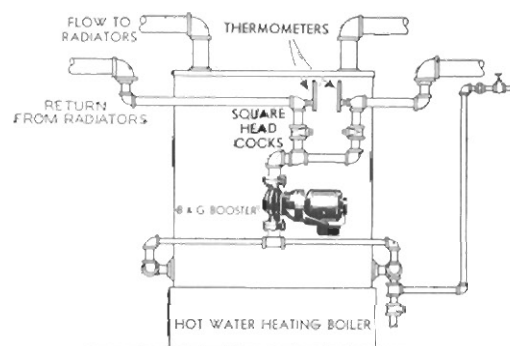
Showing a B & G Booster used to improve circulation in an old gravity system. Lower boiler temperatures may be carried, thus reducing fuel consumption.
